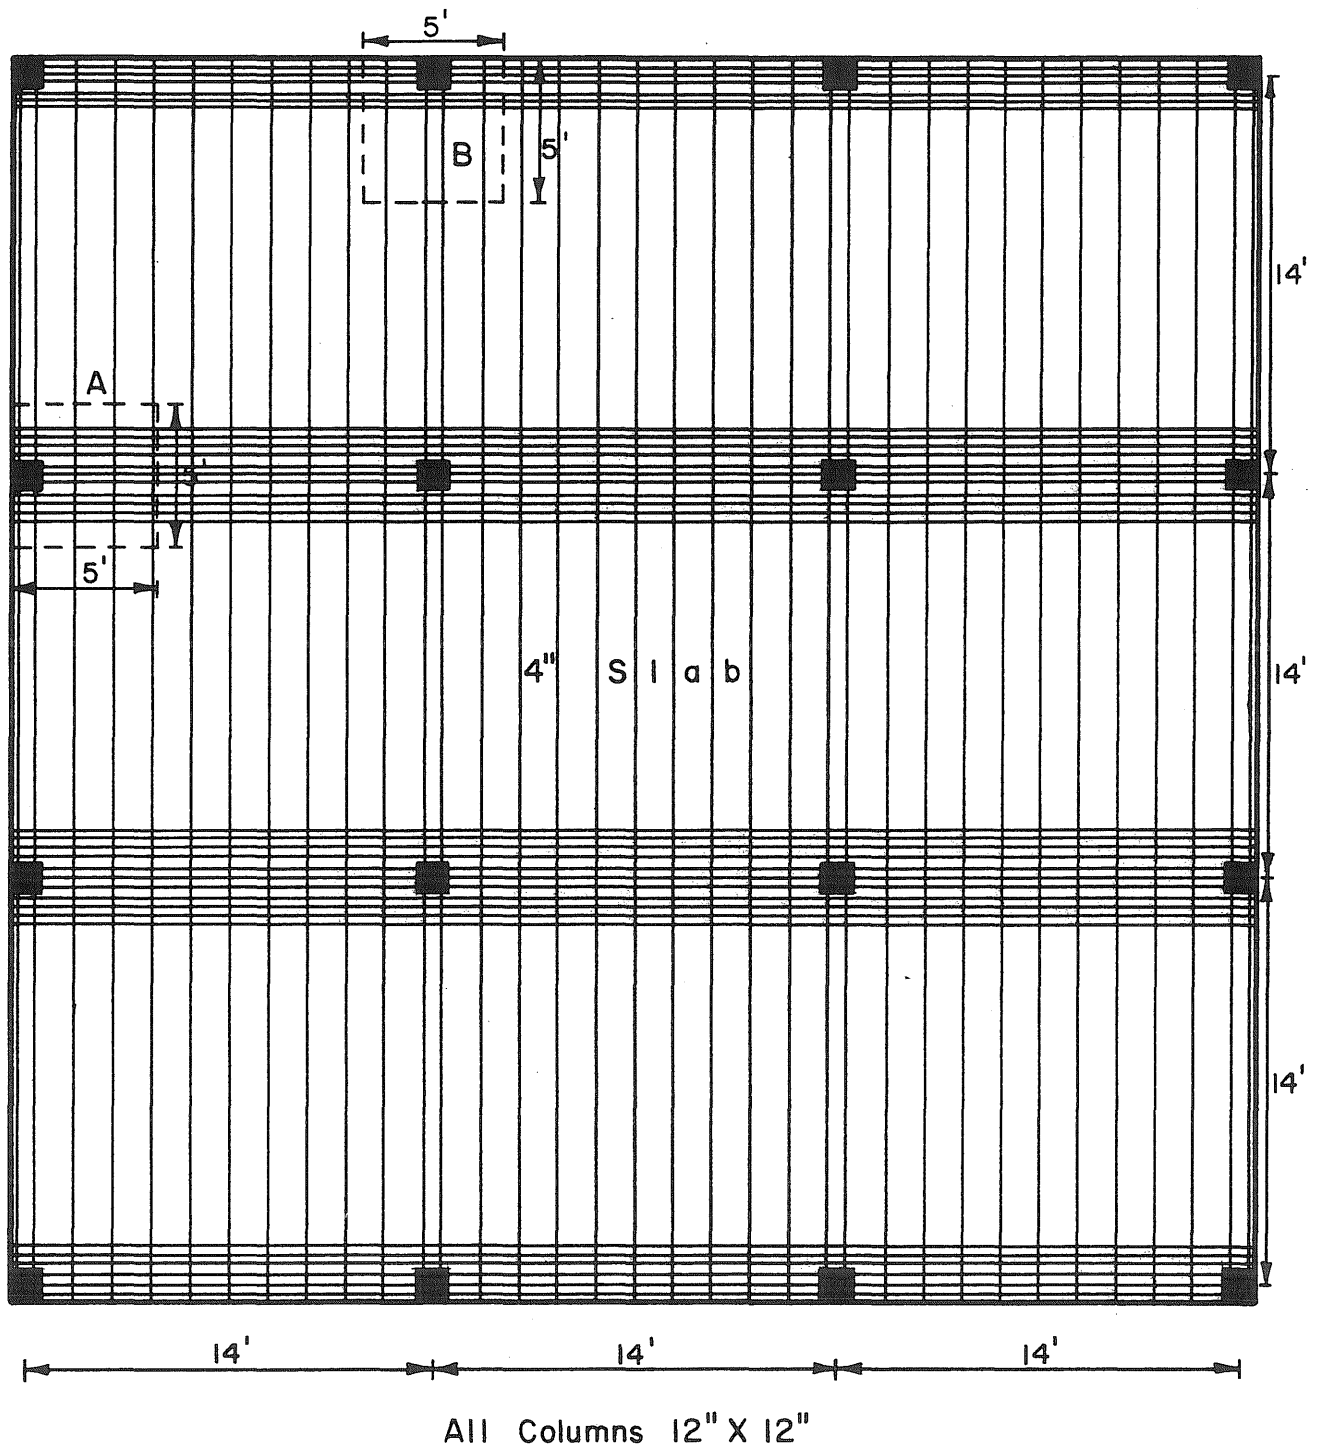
Two-Thirds Scale Model of Prestressed Concrete Slab
